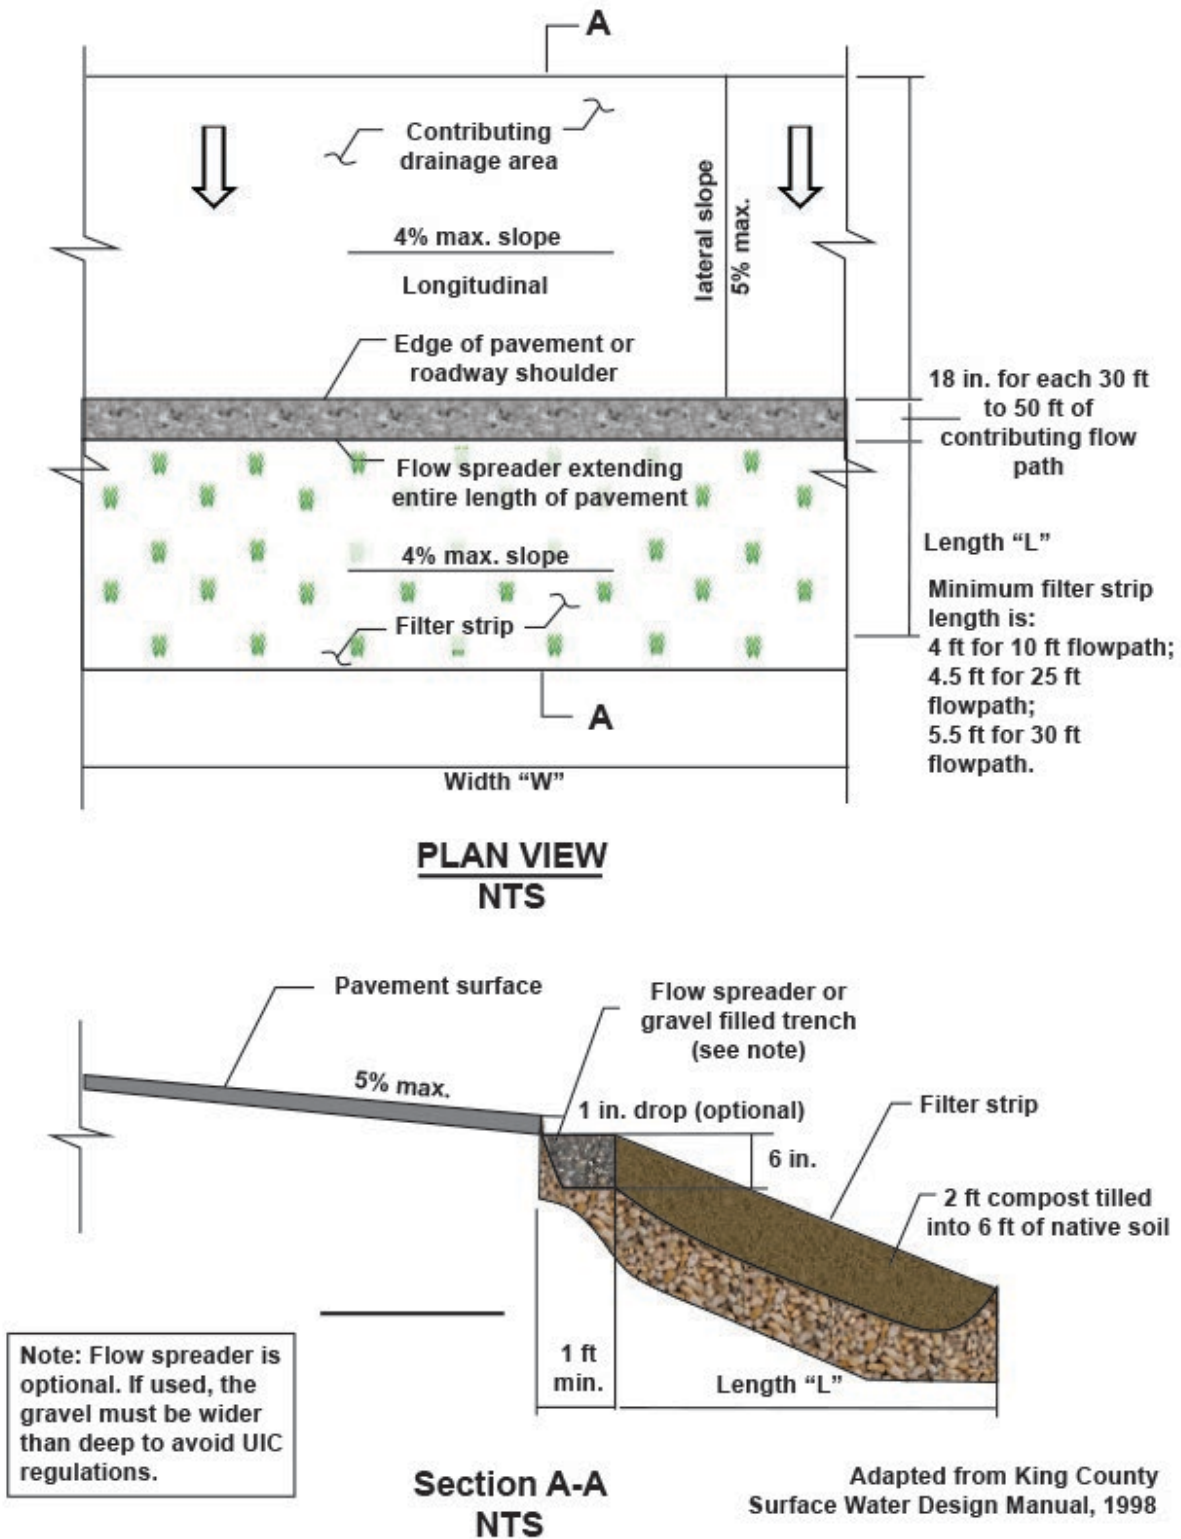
Plan and section view of a typical vegetated filter strip (adapted from King County 1998).
